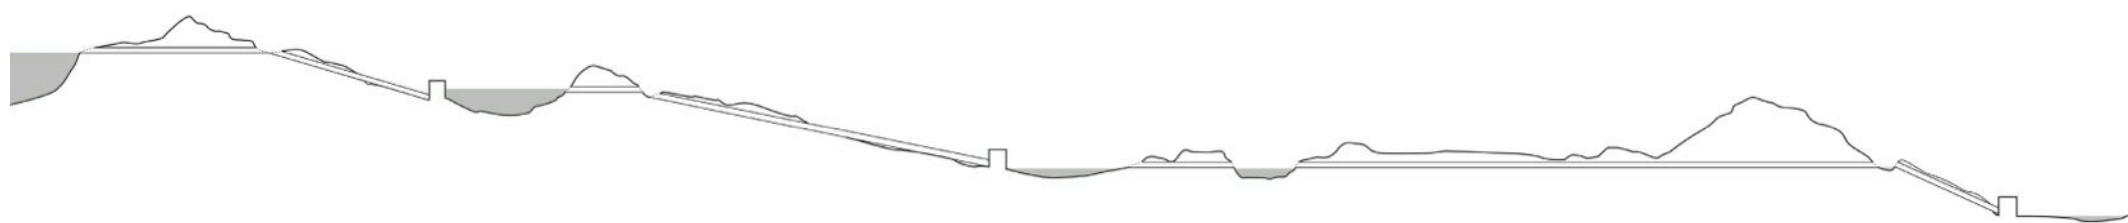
New Zealand Public Works Department. (1929-1943). *Construction of Power House Pipeline*. Waikaremoana, New Zealand.
